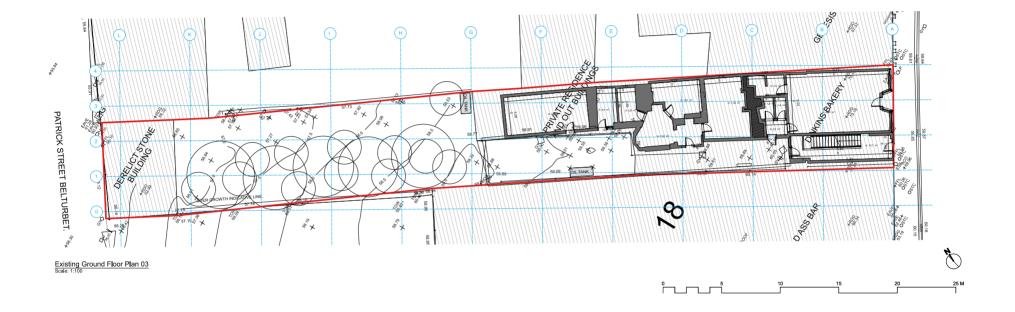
Existing Ground Floor Plan. Drawing by Cooney Architects
